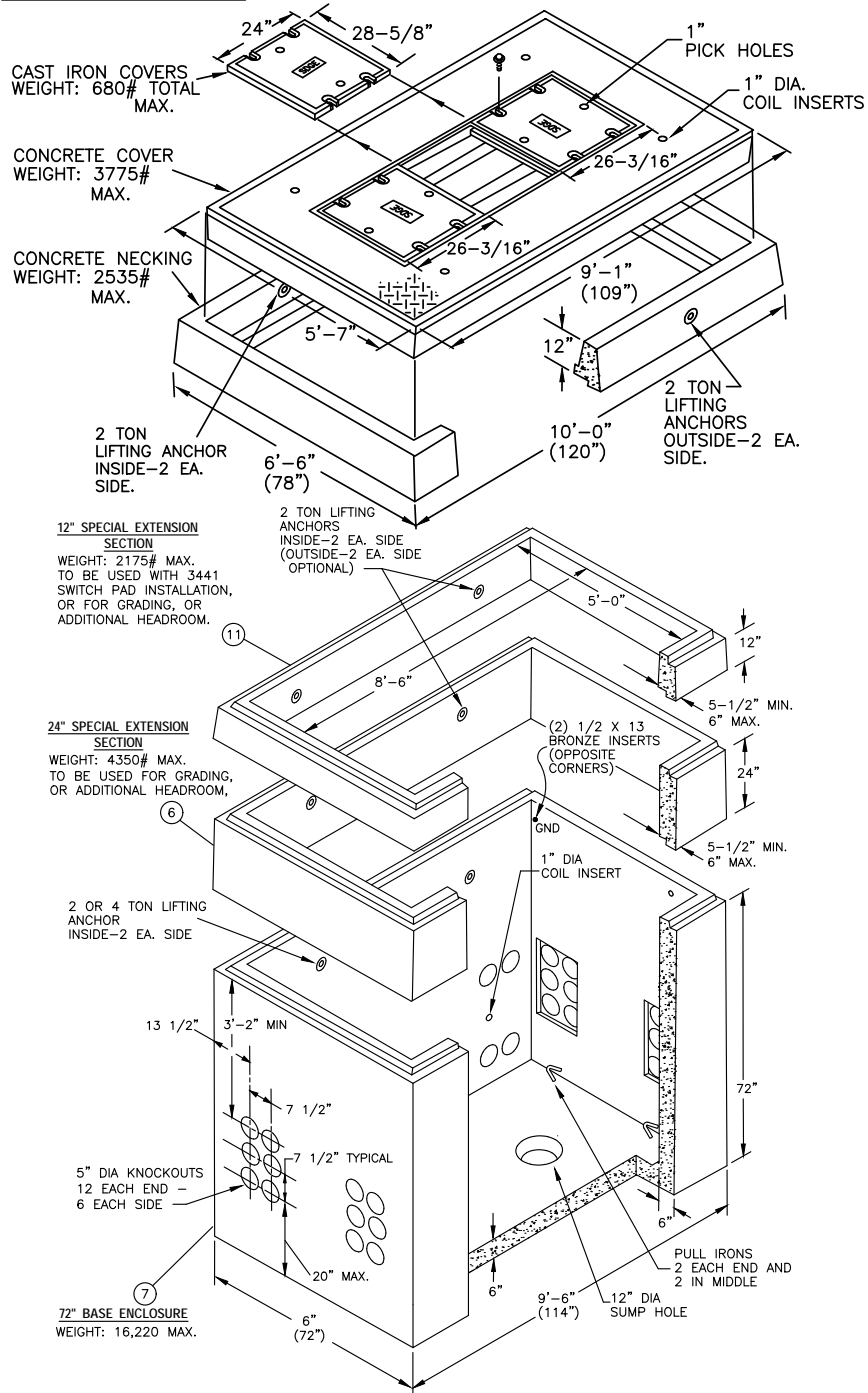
Proposed 12 kV Hand Hole Typical Drawing
